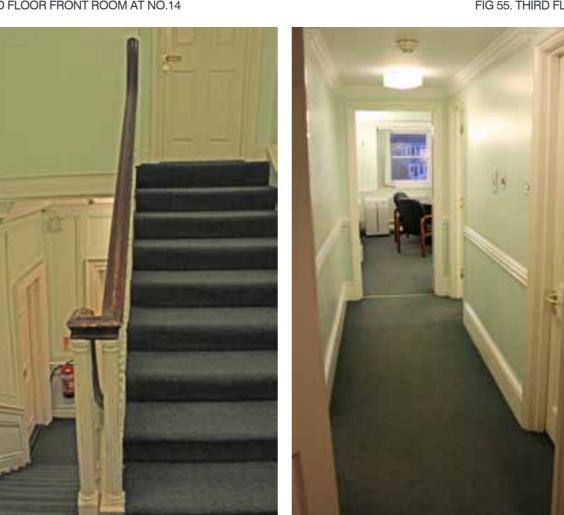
THIRD FLOOR STAIR AND HALF LANDING AT NO.14
